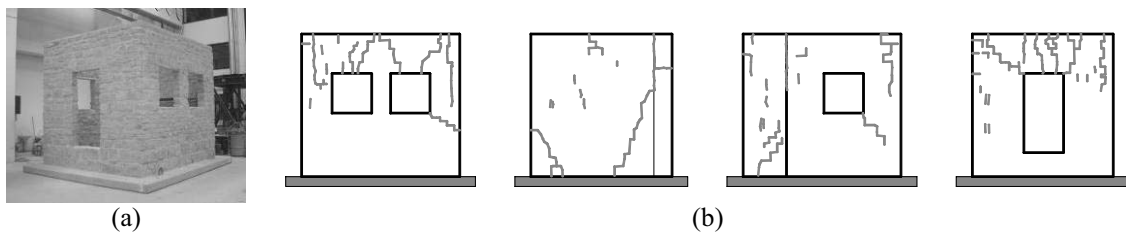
Masonry mock-up: (a) general view; and (b) final crack pattern.
